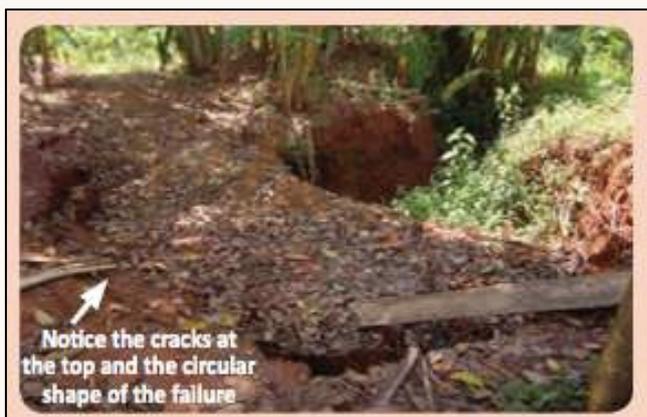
A crack forming roughly parallel to a pit wall indicates that a pit wall failure may occur soon. (Source: Hinton et al, 2009)
